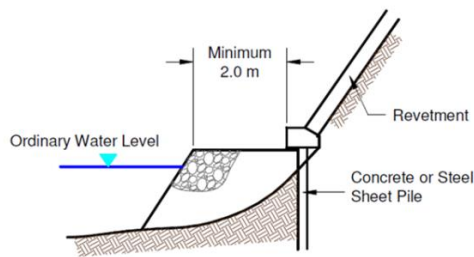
Concrete or steel sheet pile for scour protection. Figure 37: Alternative sheet piling for scour protection.
